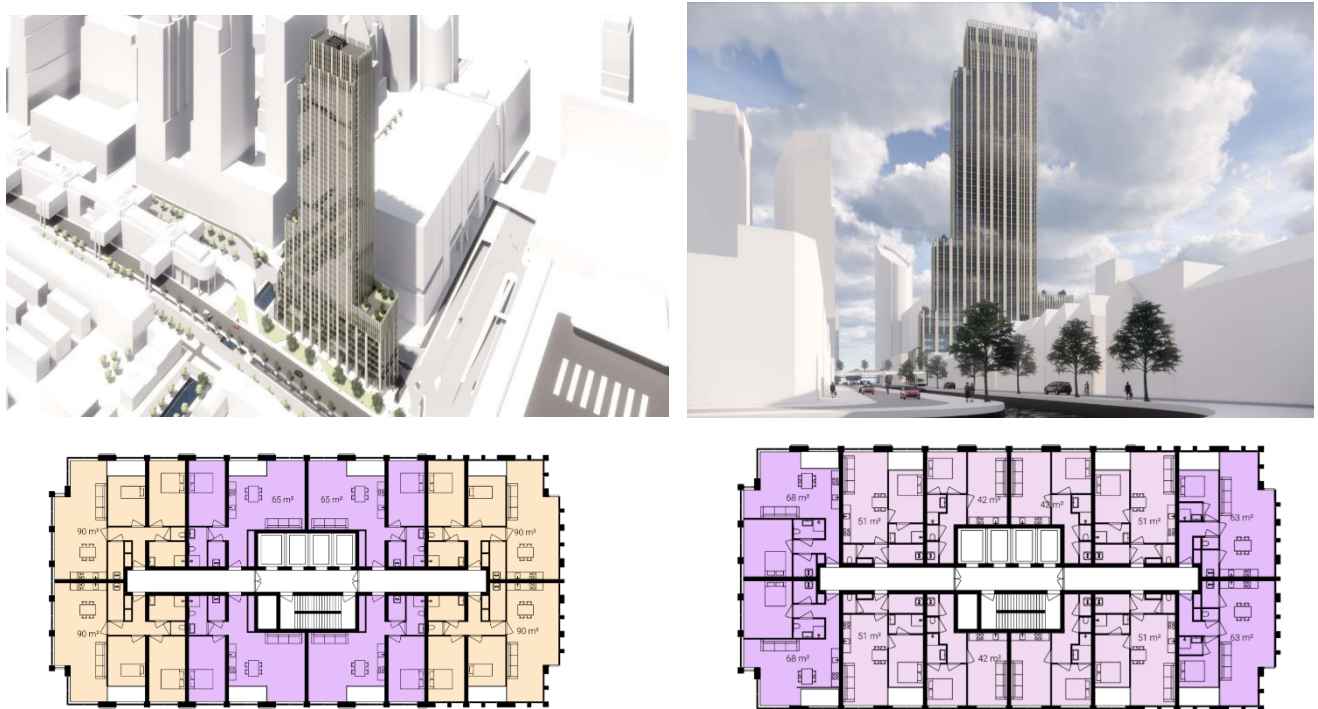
Case study impressions and floor plans (Gemeente Den haag et al. 2020)
